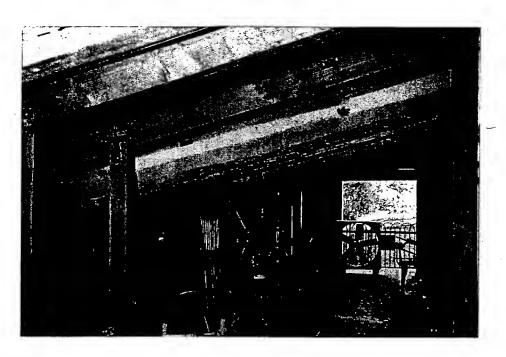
View of interior space below east bleacher, looking east to exit. Note exposed reinforcing bars and shoring due to failing concrete structure. Photo dated March 2005 by ARG.
